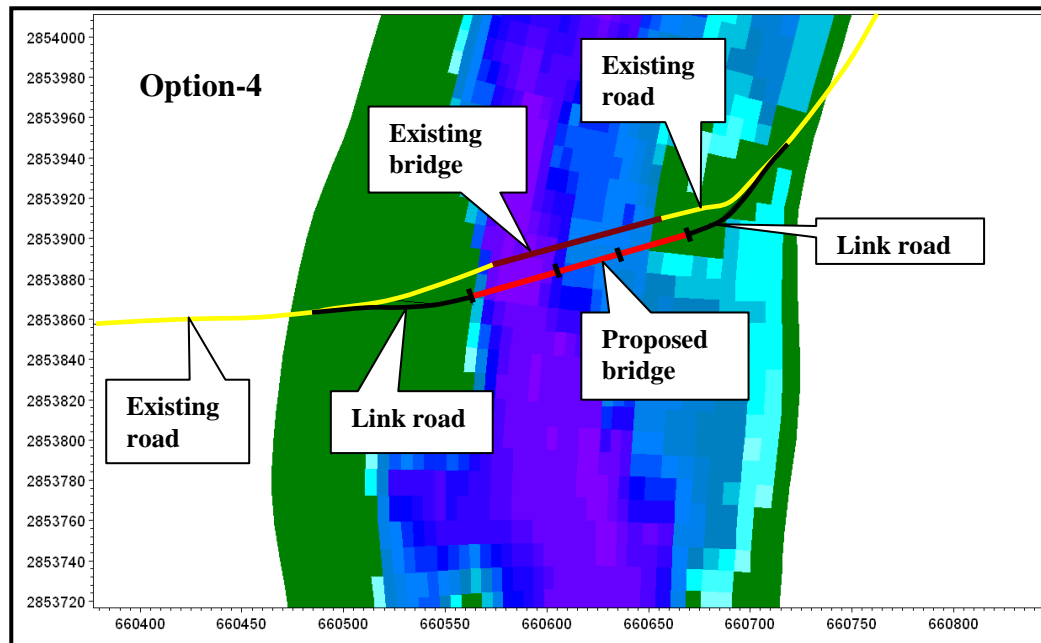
Proposed alignment of the bridge and approach road over the Punarbhaba river under Option-4
